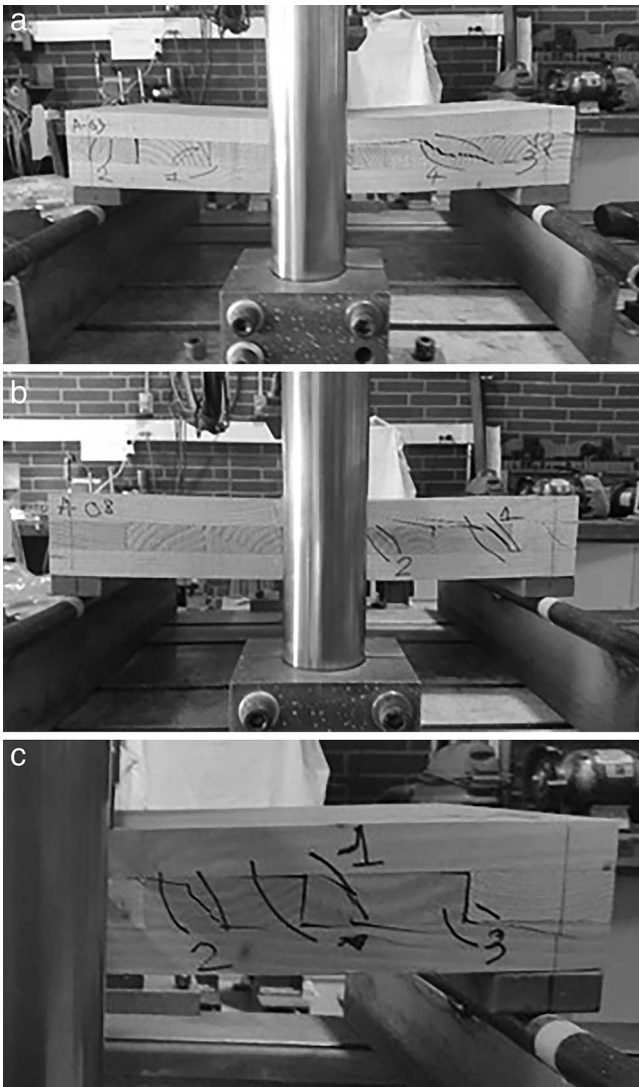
Typical rolling shear failure modes in the short beams with clear cores.
